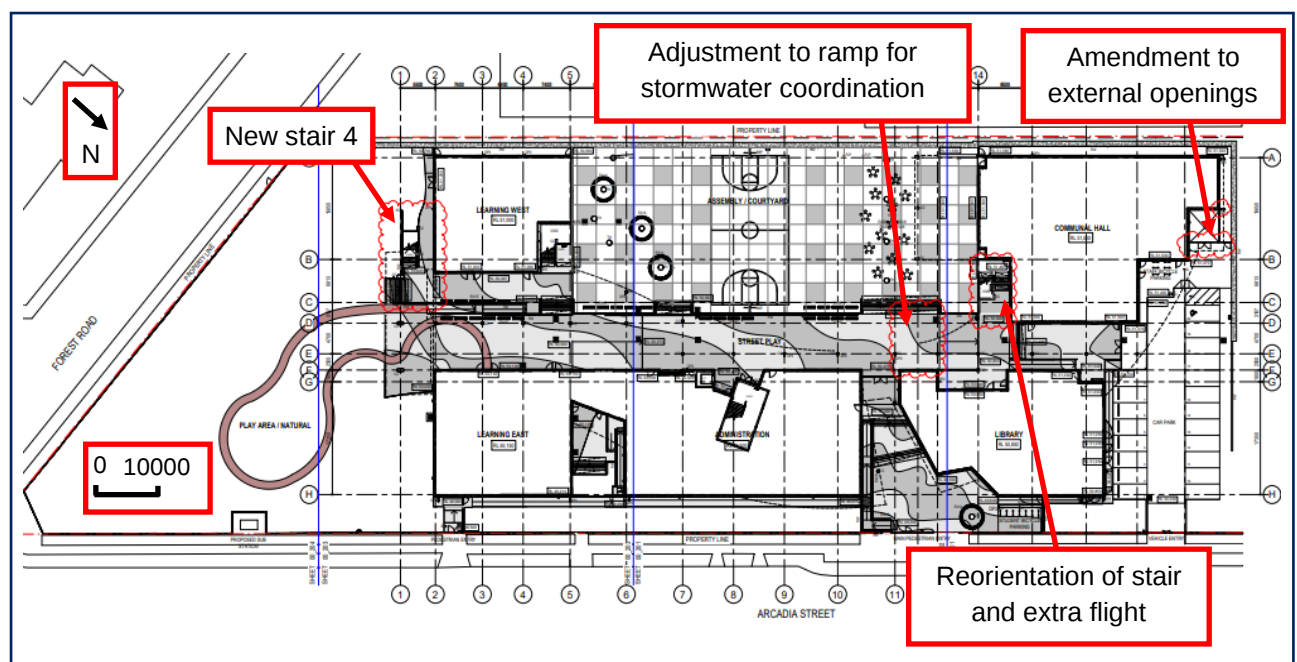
| proposed modification (Source: Applicant's modification application 2020)
